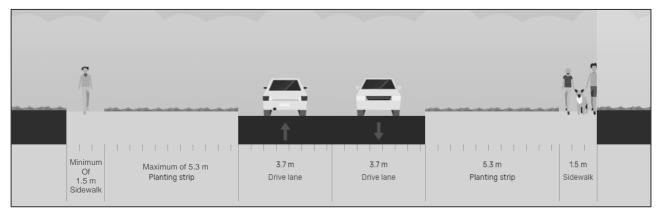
Proposed Willowbank Road Cross-section (21 metres)
